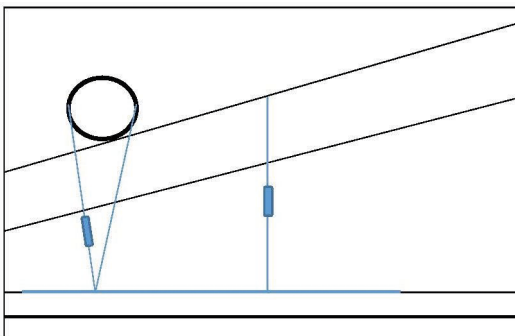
Scheme of solution with large roof beams used to hang anchor the iron cables attached to the floor beams
